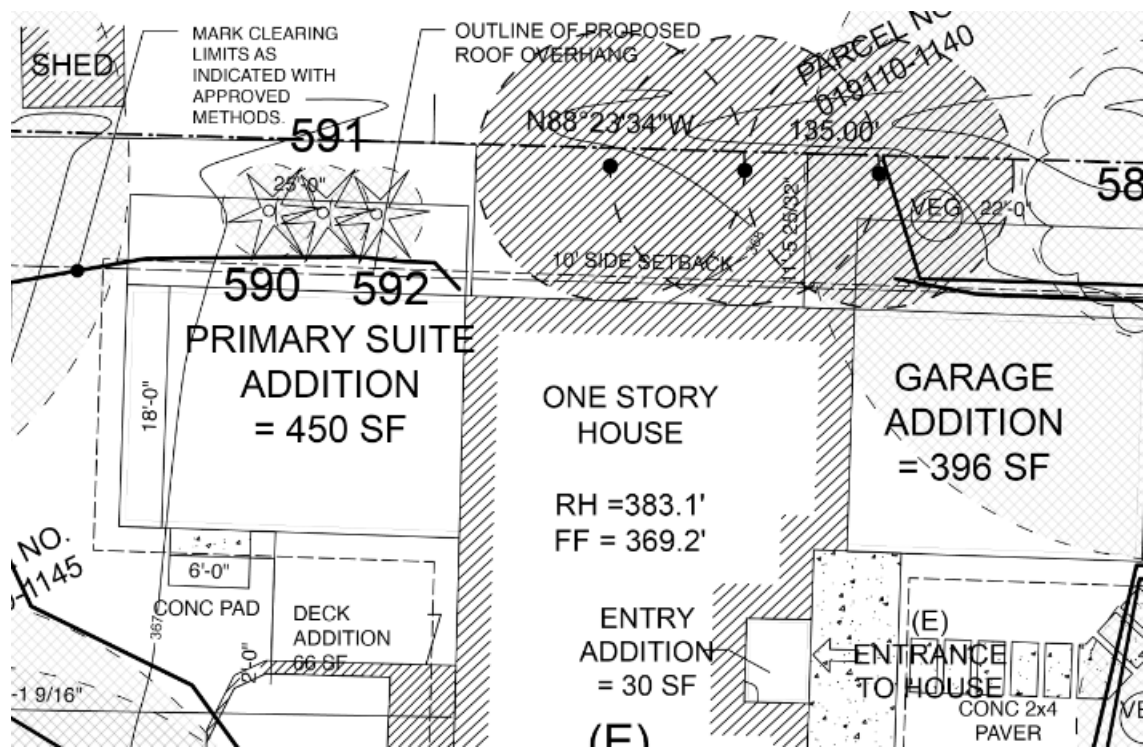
Excerpt from the 'Proposed Site Plan'. The original August 2023 report discussed how the project would impact the two trees in significant detail. The 590-592 trees are small and can either be protected in place or transplanted for the duration of the project.
